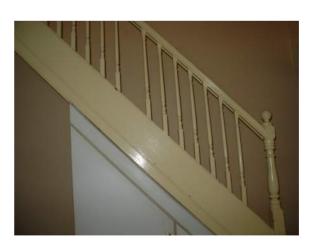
Staircase with missing banister rungs in terrace No. 101 Darlington Road. (Source: Janice Hogg, April 2008).
